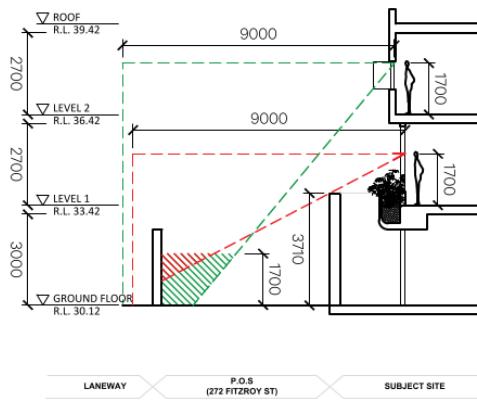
shows the portions of the SPOS at No.272 Fitzroy Street subject to potential overlooking form the east-facing habitable room windows of Townhouse 1.
